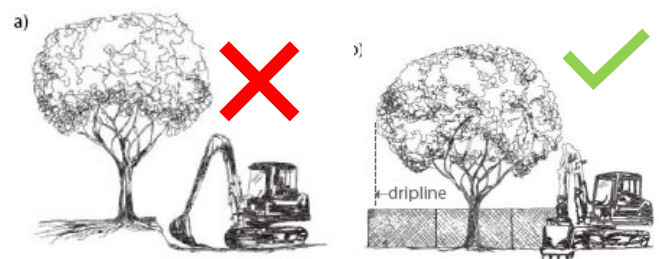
(Top) Do not trench or excavate within the root zone of trees. (Bottom) Install tree protection fencing beyond the dripline of the tree(s) (Source: Auckland, 2009).
